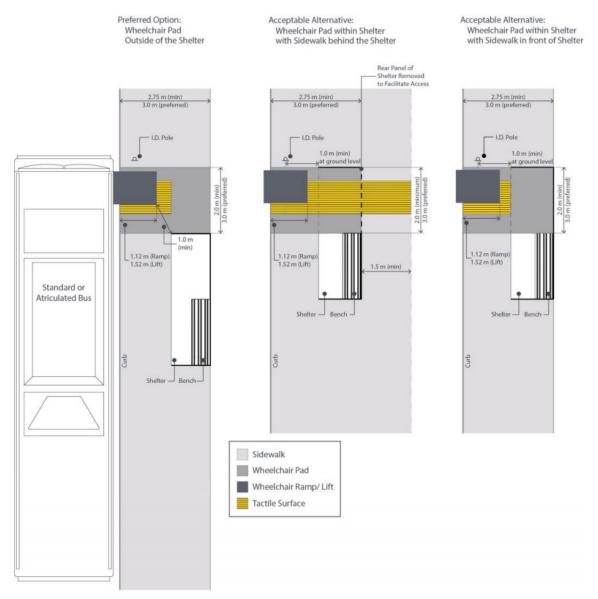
Wheelchair Pad Location and Dimensions (Light Duty Bus)
